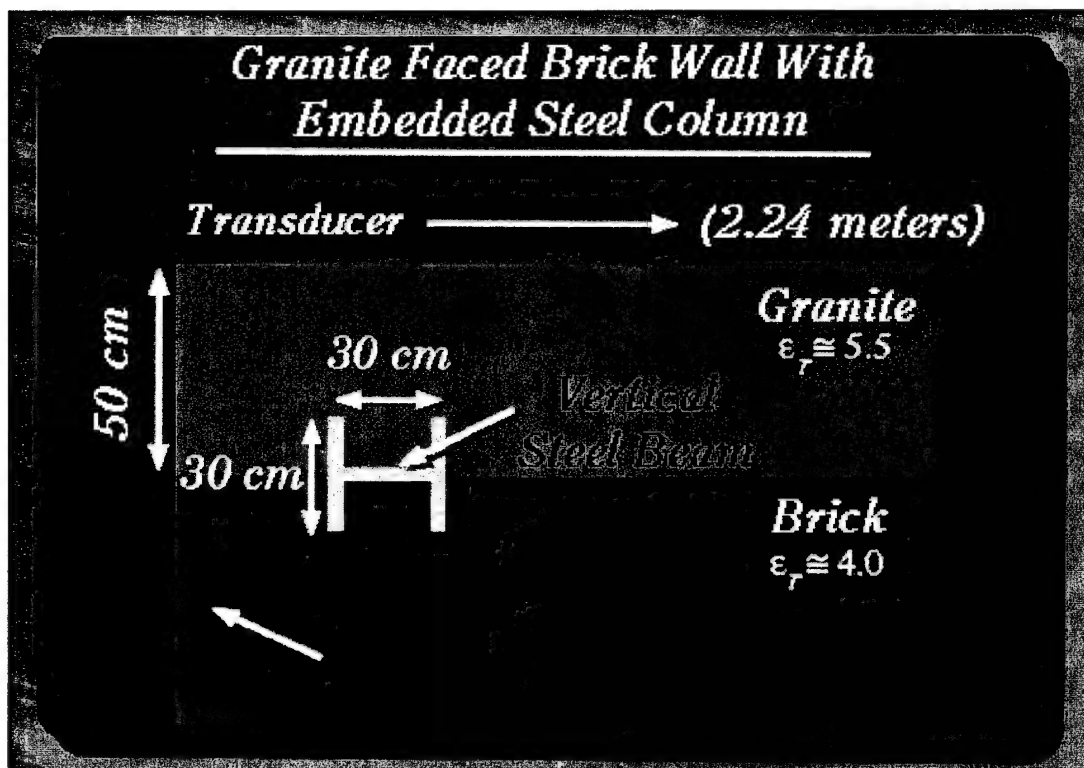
Steel column inside granite/masonry wall with dimensions as determined from radar data.
